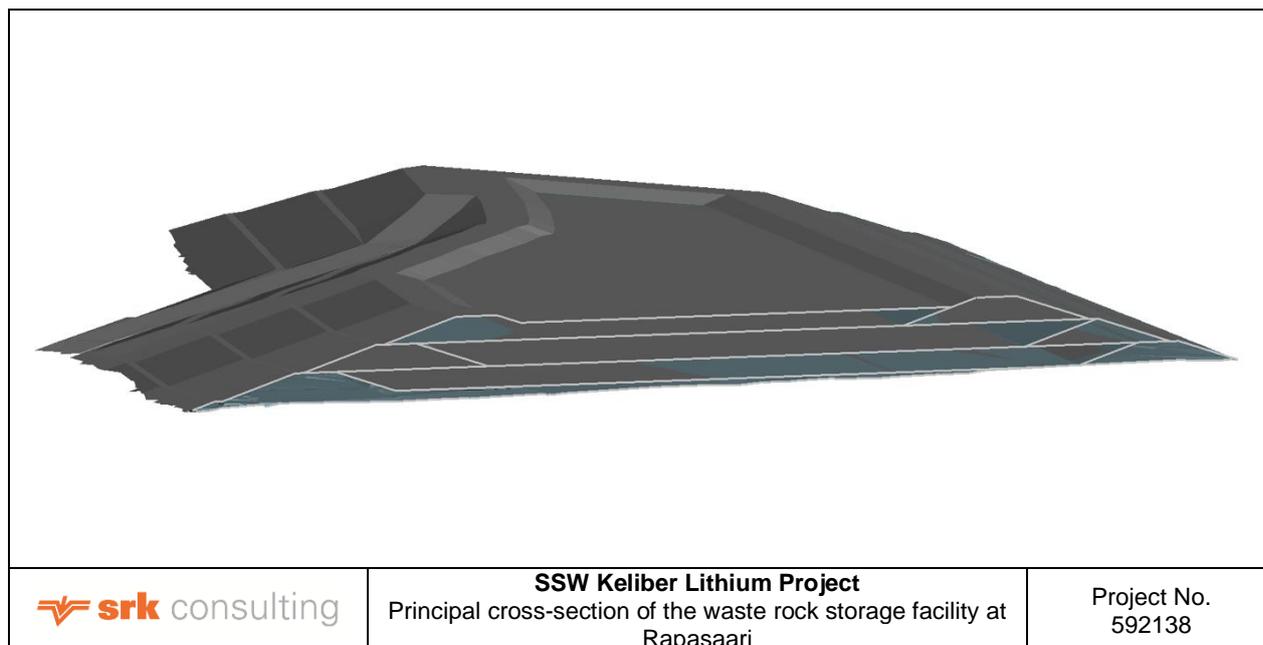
Principal cross-section of the waste rock storage facility at Rapasaari
